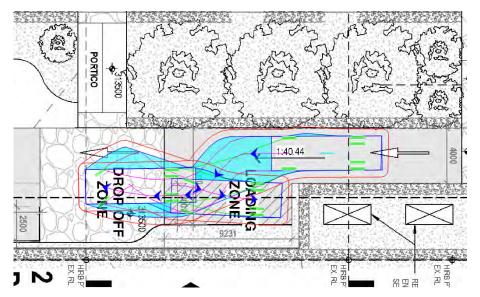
8m Truck Entering Loading Zone and Short Reverse
